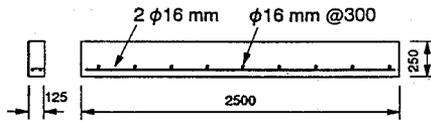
Details of singly reinforced beam tested by Cope et al.
